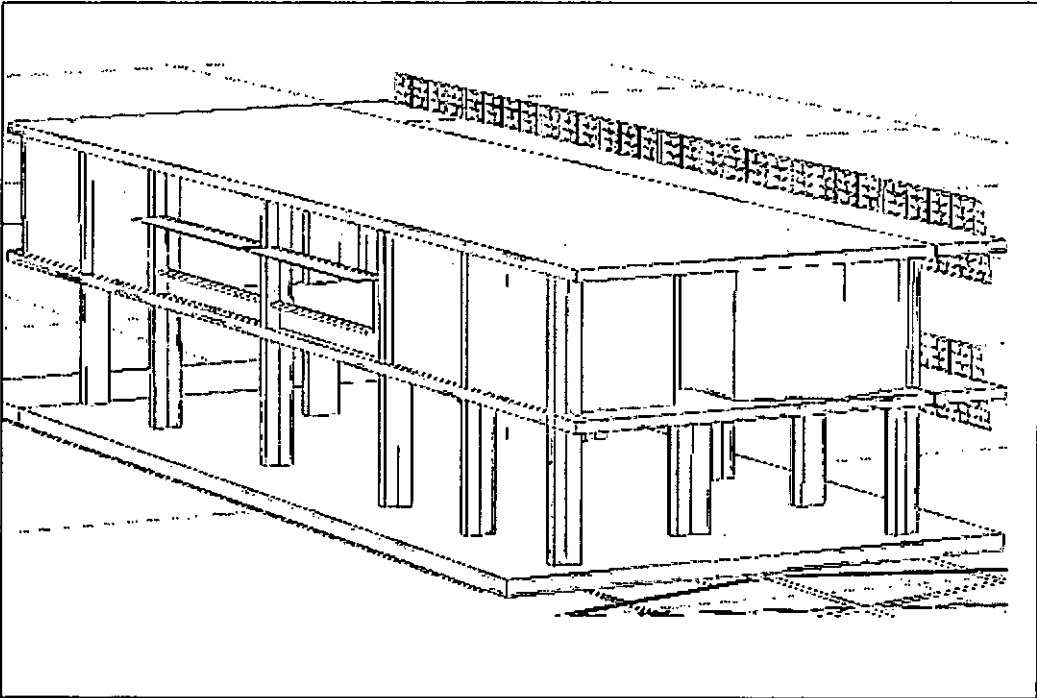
(c): Case 19: light shelf at 2m (north opening)
